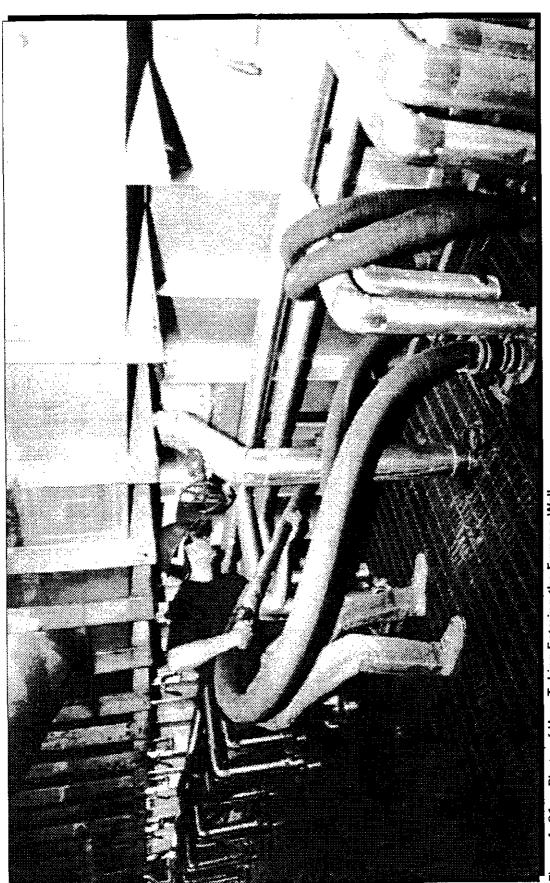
Photo of Urea Tubing Entering the Furnace Wall
